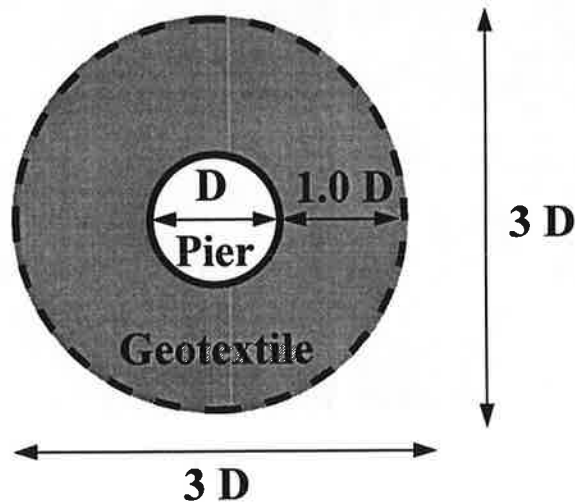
Sketch of placement of geotextile around a circular pier.
